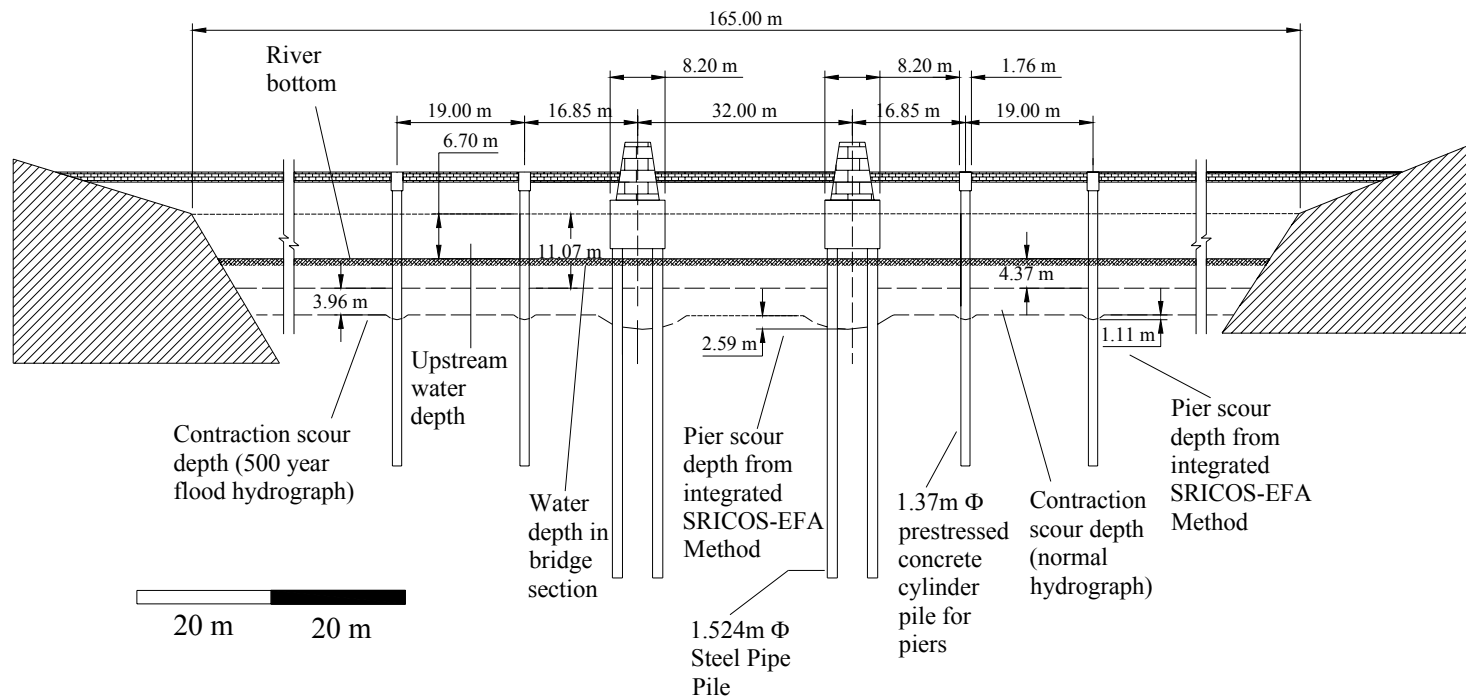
Scour Profiles for the New Sloop Channel Bridge on Wantagh Parkway
